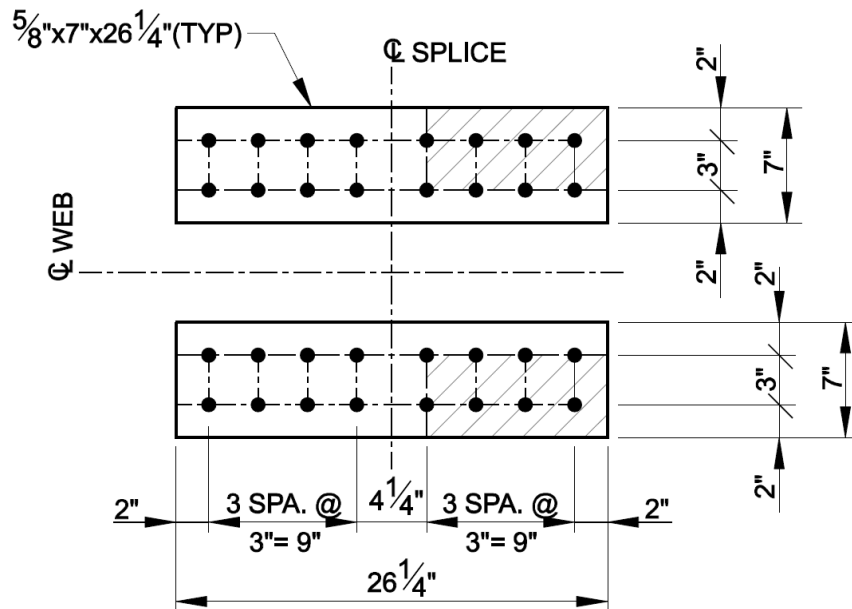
Assumed Block Shear Failure Planes for Top Flange Inner Splice Plates
